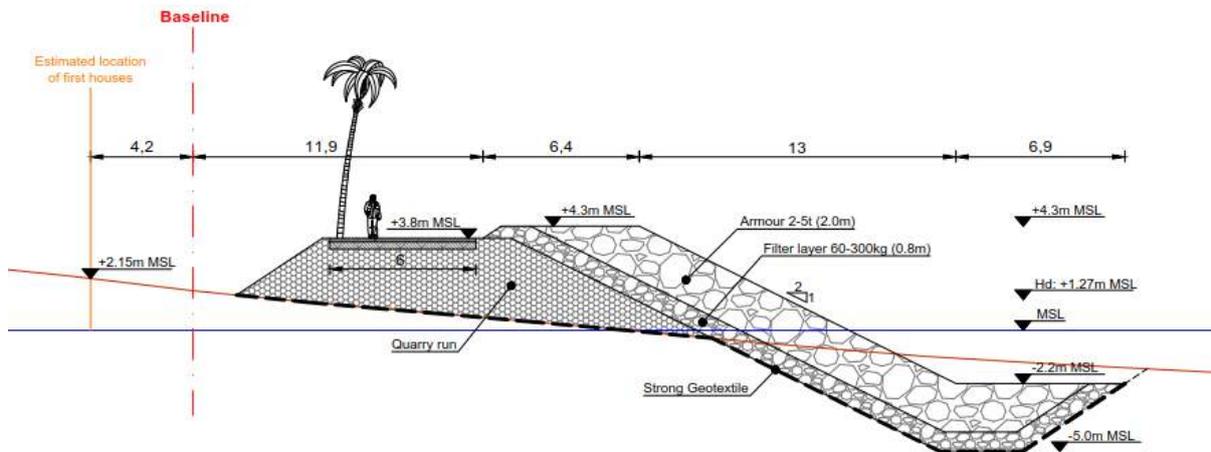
Principle cross-section Revetment West Point - Revetment Chainage 900
